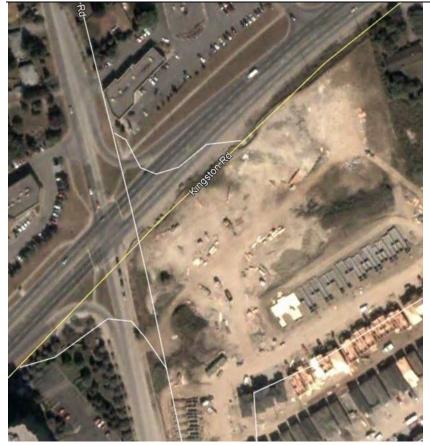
Construction activities southeast of Valley Farm Road and Kingston Road in 2002
